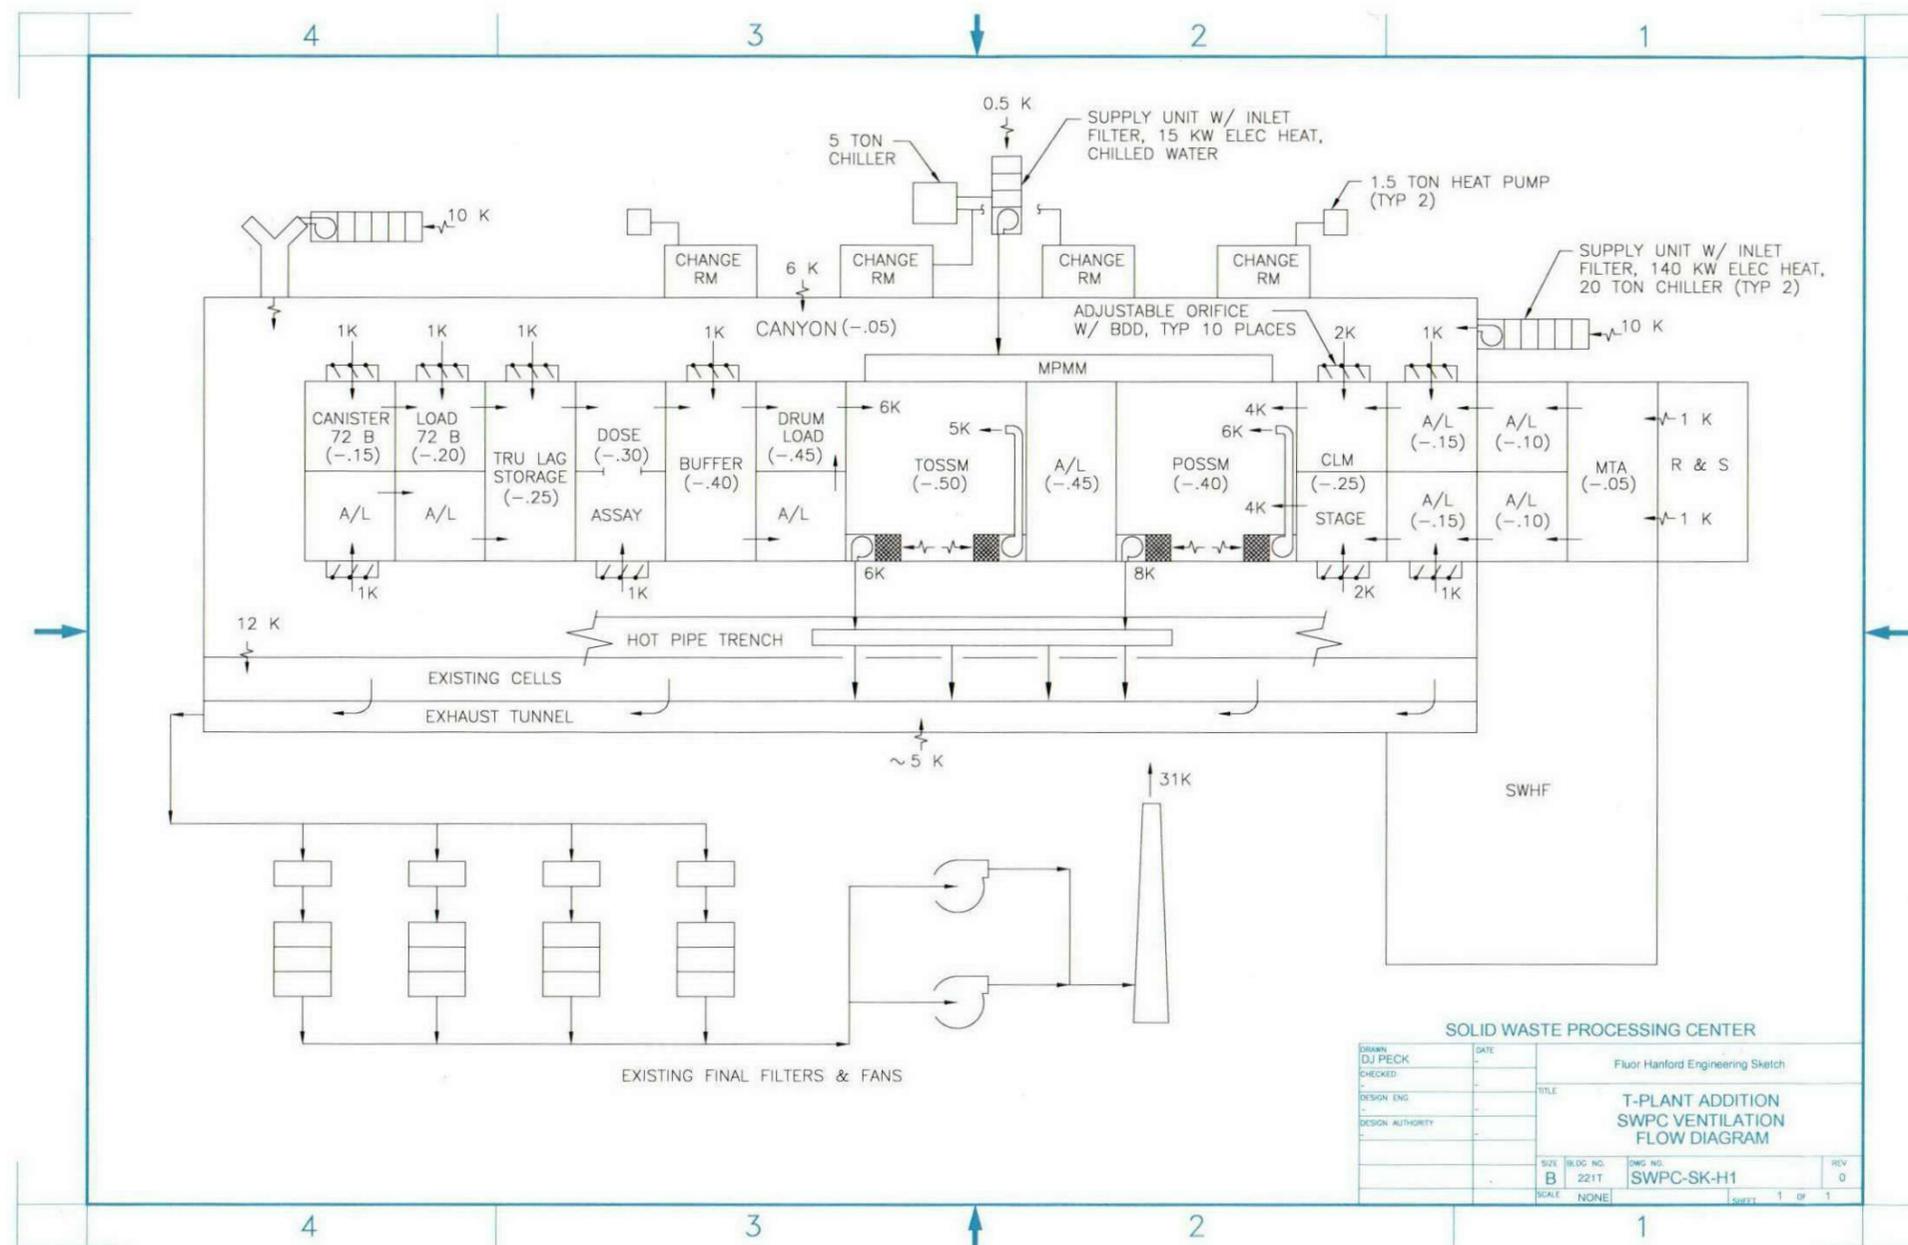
T Plant Addition SWPC Ventilation Flow Diagram
